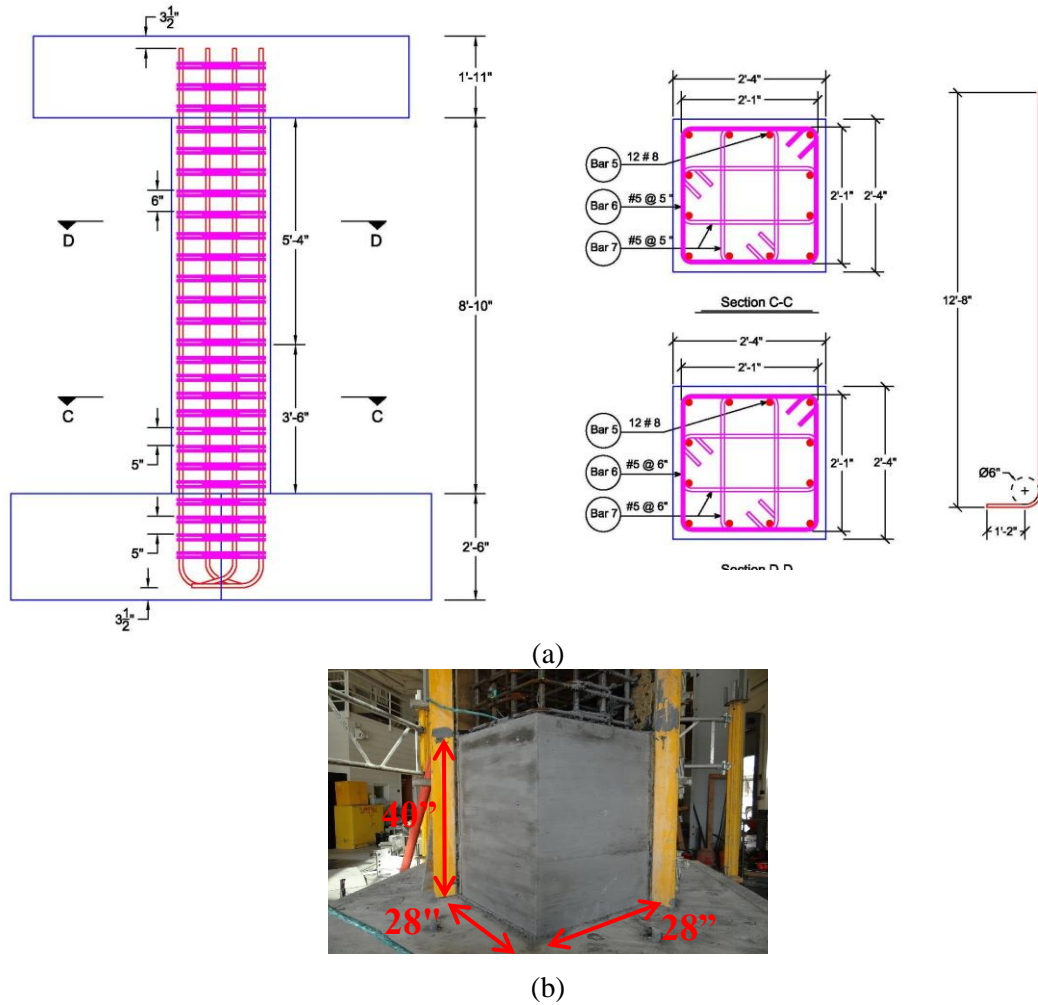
a) Dimensions and reinforcement details of the test columns and b) UHP-FRC at the bottom 40 in of the UHP-FRC column (Chao et al., 2021)
